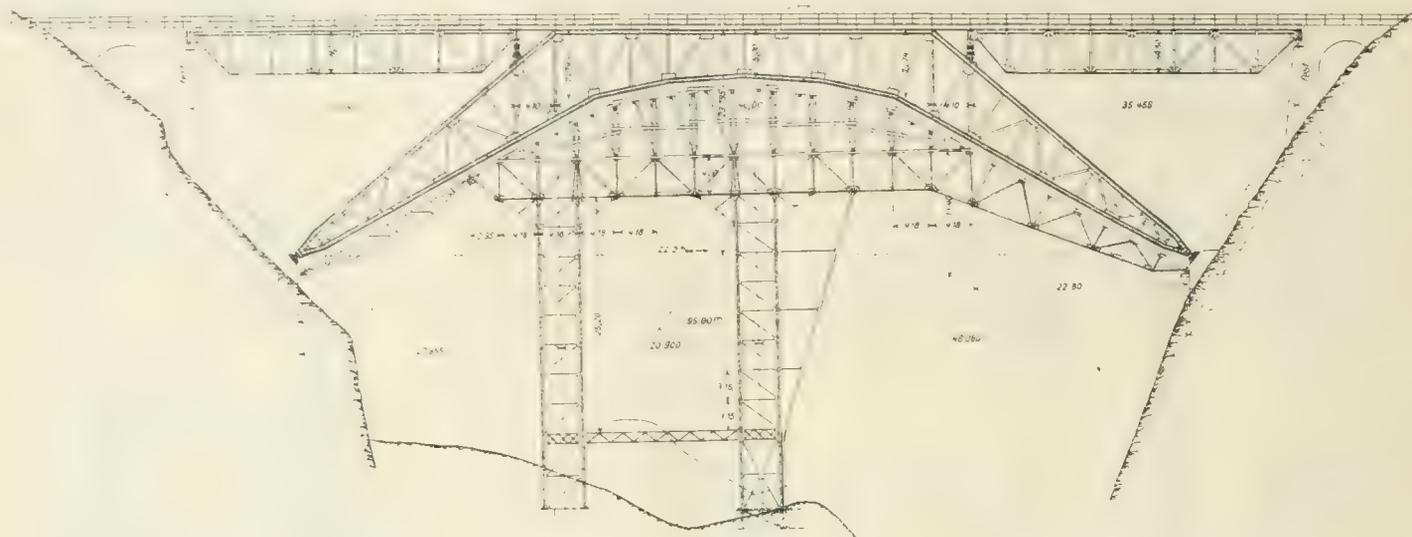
Plan and Elevation of Bietschtal Viaduct, Switzerland, Showing Type of Construction of Viaduct and Falsework.
